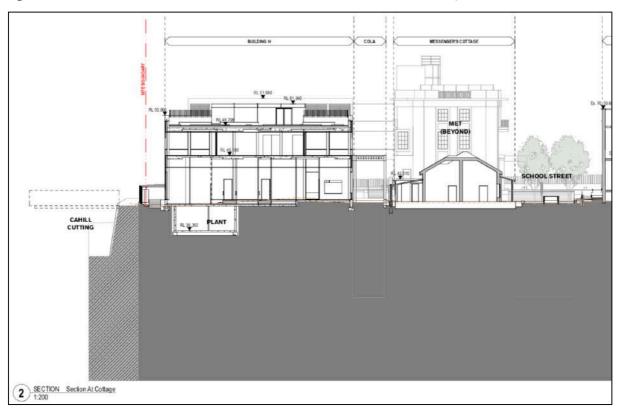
Section 2, c. North-South- New Basement visible (Source: FJMT DWG DA-4001, 18.12.19)
